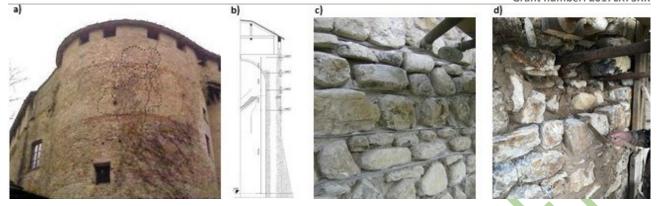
Intervention of seismic improvement with stainless steel strands on the North tower of the Castle of Compiano - Parma (a). The stainless steel strands have been inserted at different rates of the tower (b,c), then embedded inside the grouting of mortar and bound to the perimeter walls (d). Pictures from (Zanello 2017)
